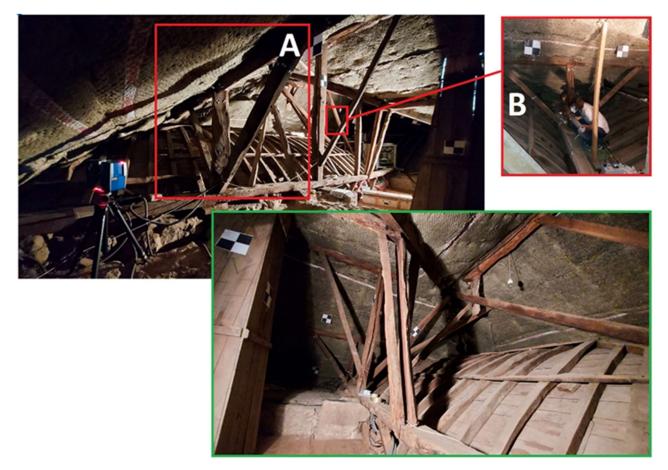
Guimarães chamber roof detail, with indication of the analyzed trusses (A and B).
